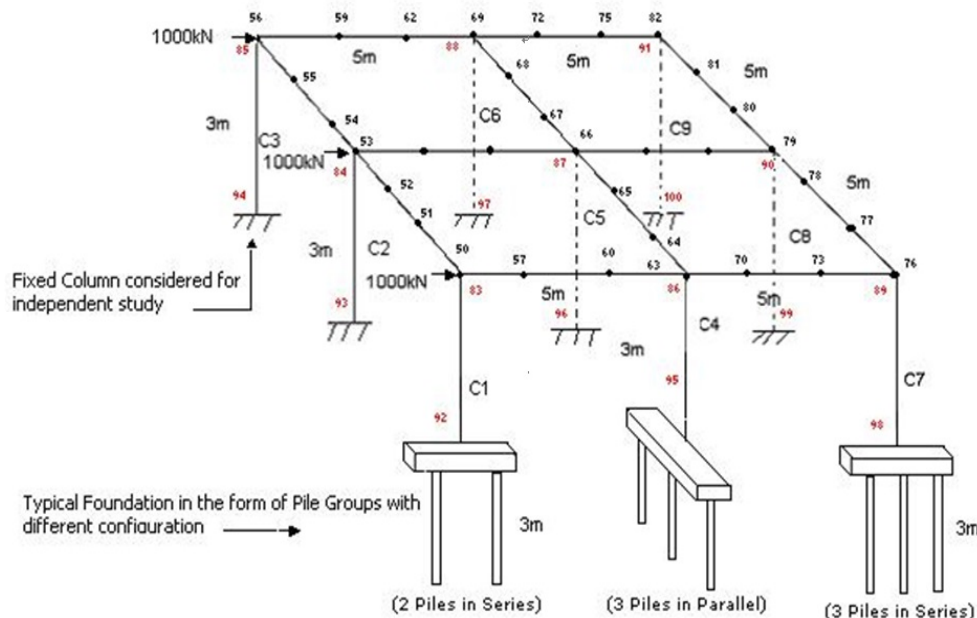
Typical building frame (After Chore *et al.* 2010a)
